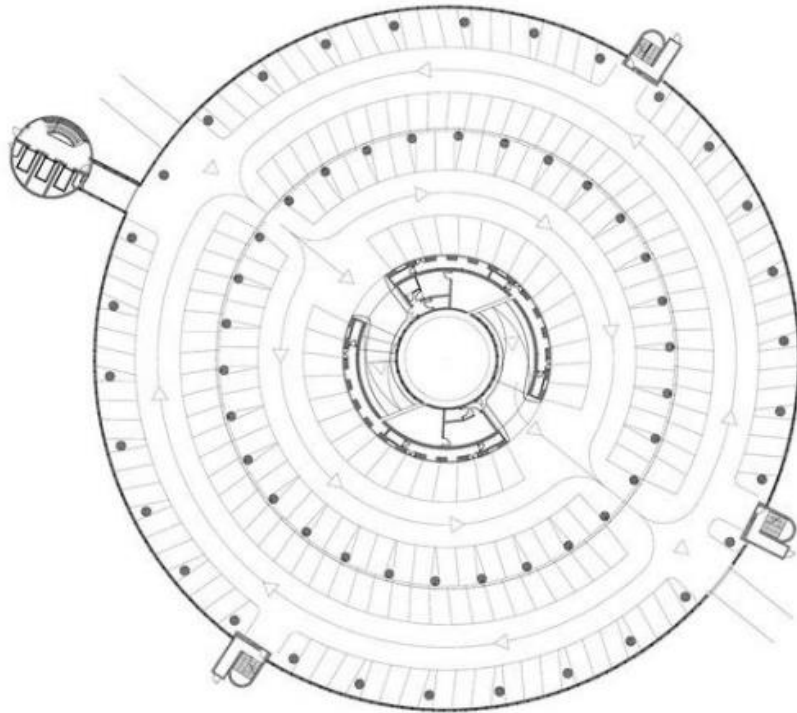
Hamburg Airport's "Rotunda" parking; Typical Floor Layout
